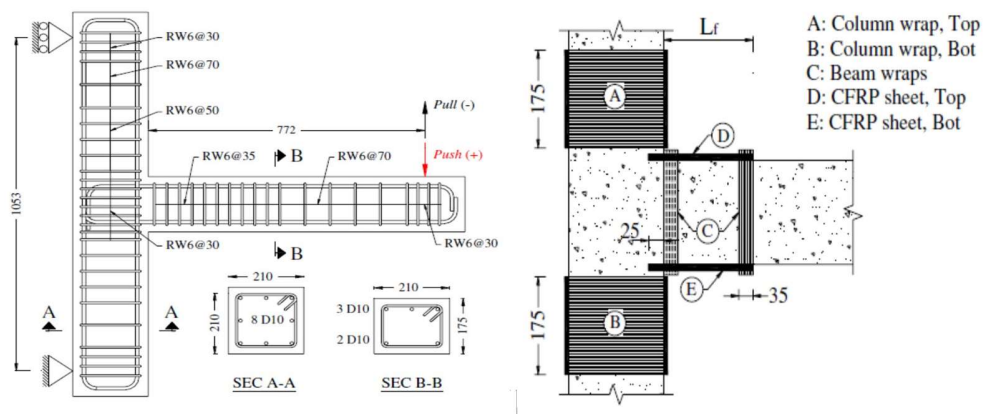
Typical configurations for beam-column joints strengthening (a) geometry and reinforcement details of test specimens (b) flange-bonded retrofitting scheme [9].
